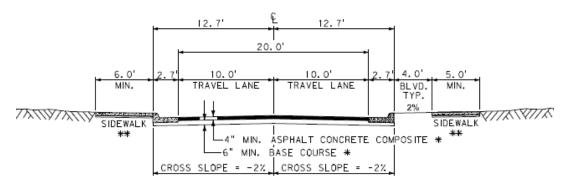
Standard Tribal Housing & Residential Street Typical Section - Rural
